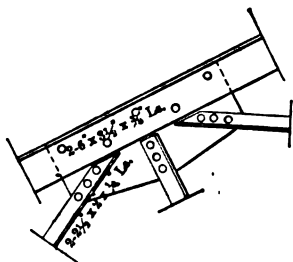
A. Detail of Joint D, Fink Truss, Fig. 7
